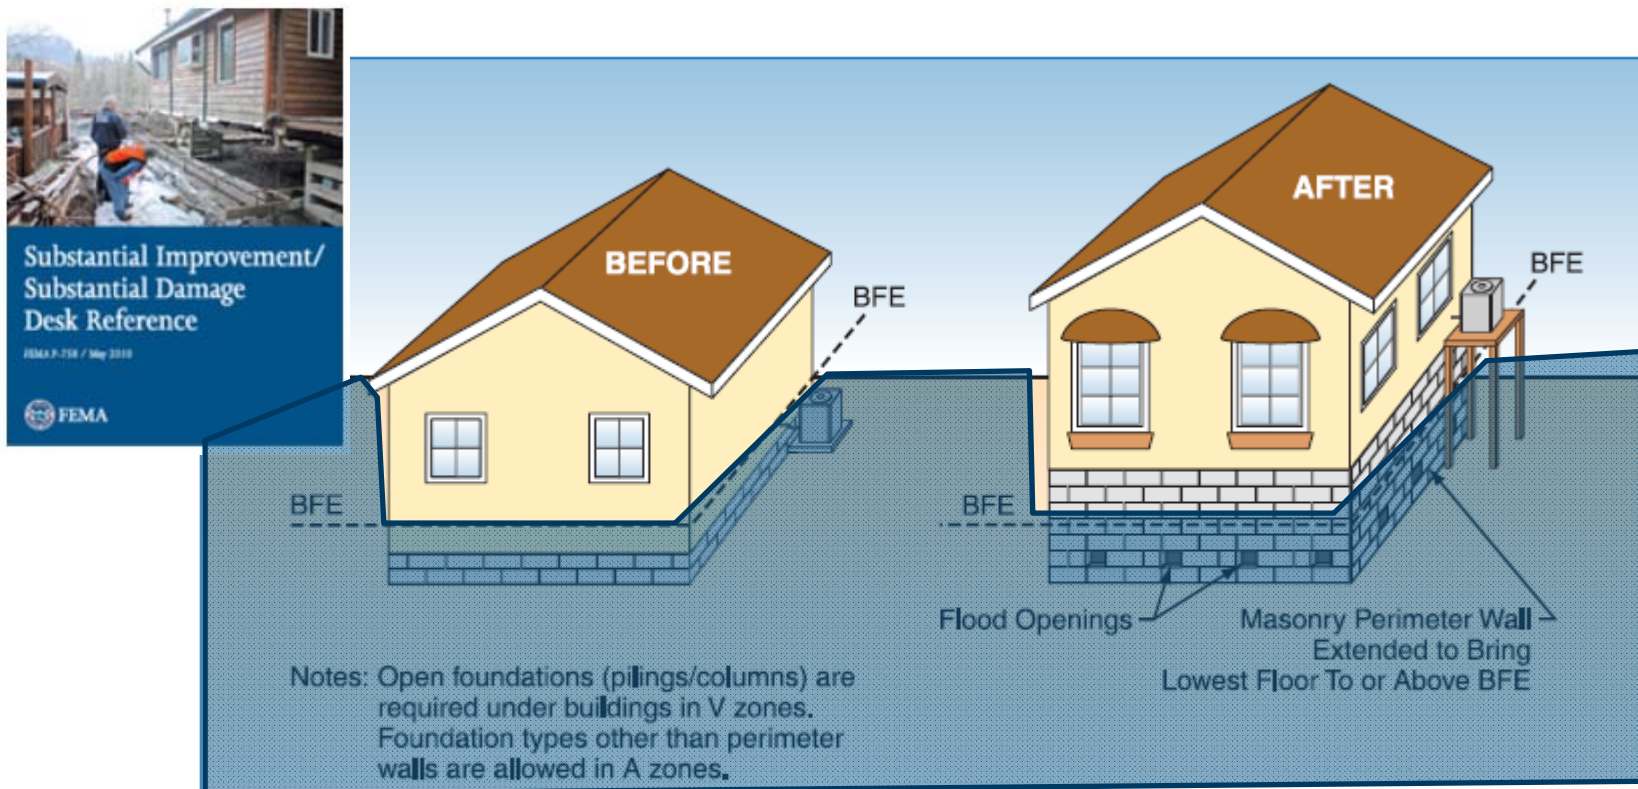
Rehabilitation or remodel (no increase in footprint) of residential building in an A zone – the proposed work was determined to be a substantial improvement. The building is brought into compliance by elevating it on an extended perimeter foundation wall, installing flood openings, and raising the HVAC equipment onto a platform.
